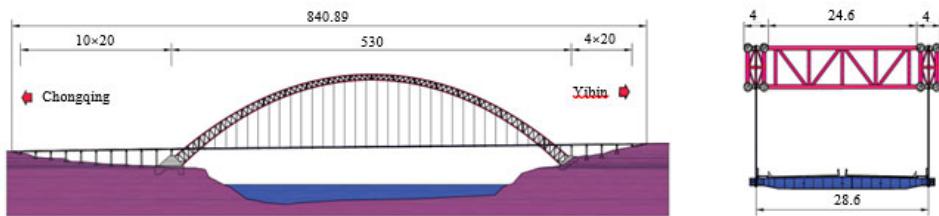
The Hejiang Changjiang River 1st Bridge (unit: m).
